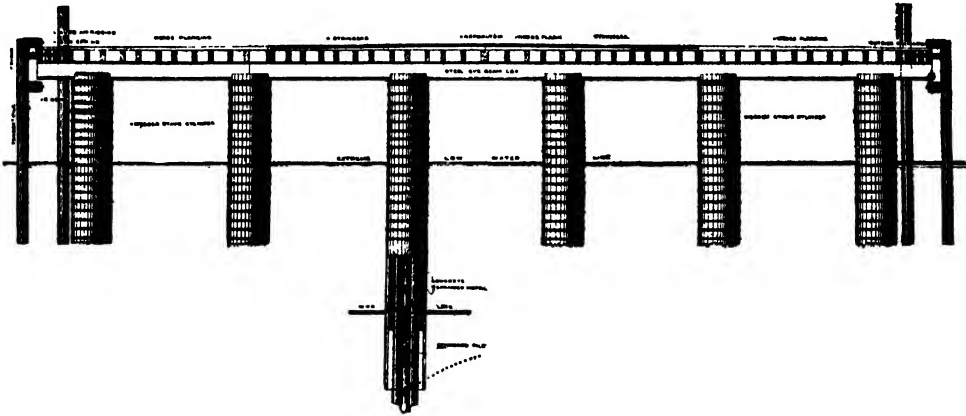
Cross Section through Wooden Cylinder Pier.
